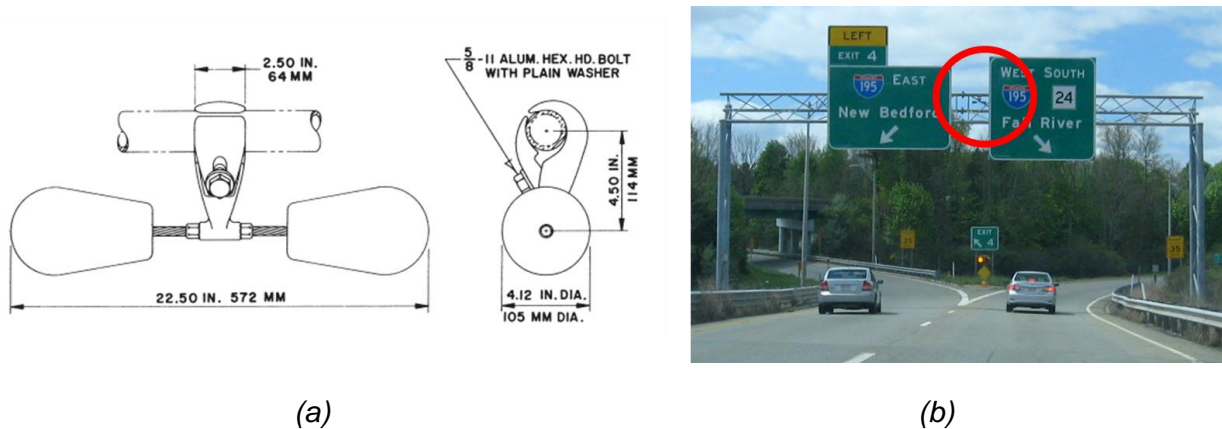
Damper B images: (a) schematic of damper from the manufacturer; (b) picture of a Damper B-type damper installed on a highway sign structure.
